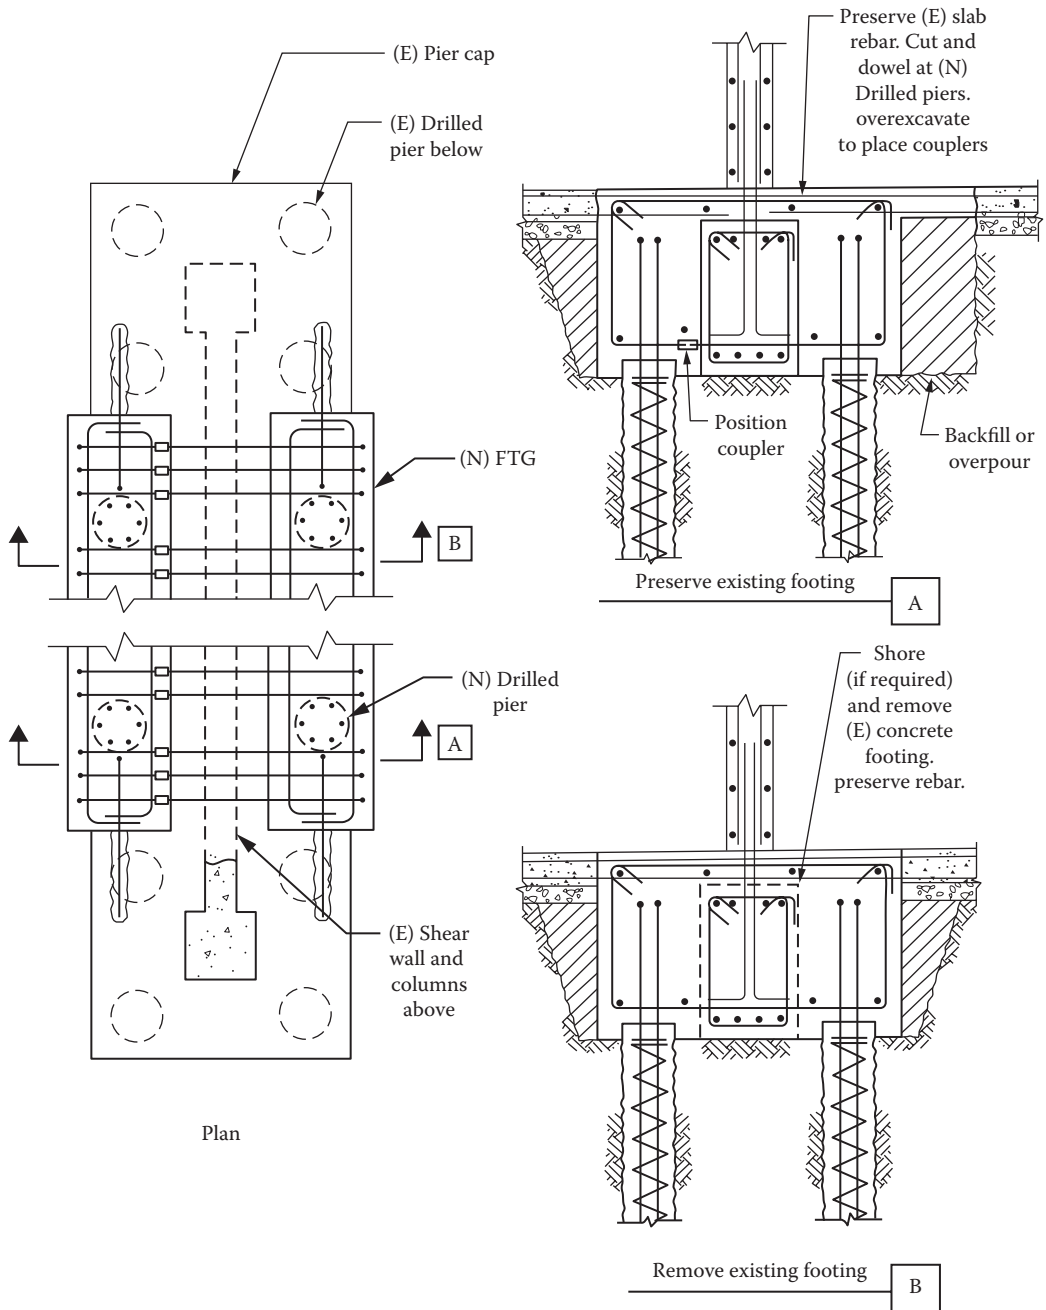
Adding drilled piers to an existing drilled pier foundation.
